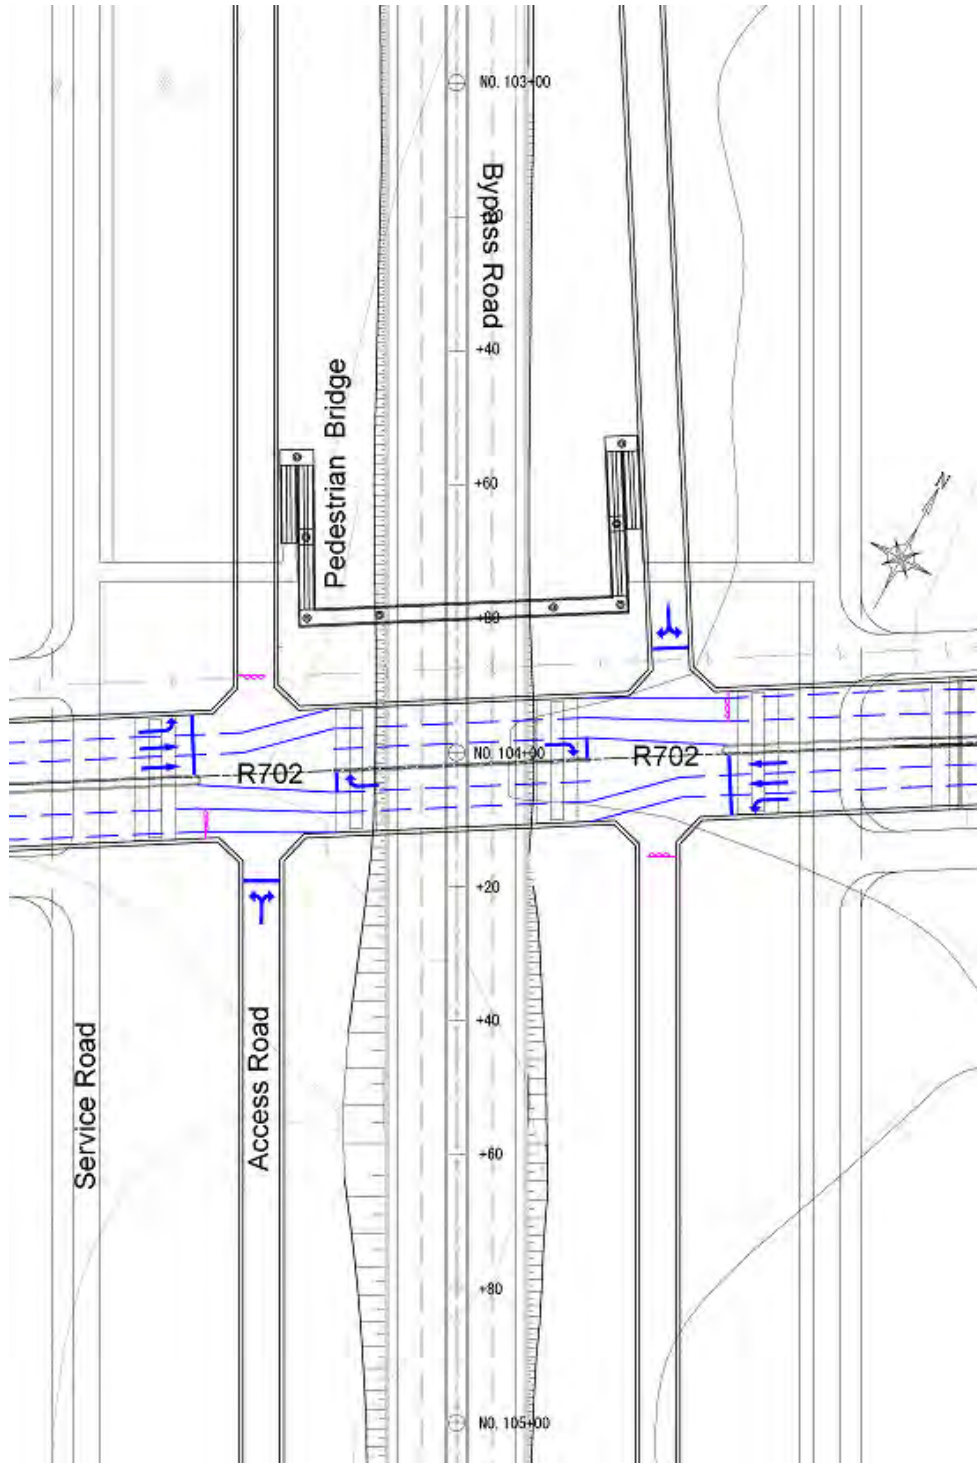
Traffic Lane Configuration at the Flyover Bridge for connecting with R702 and Project Road
